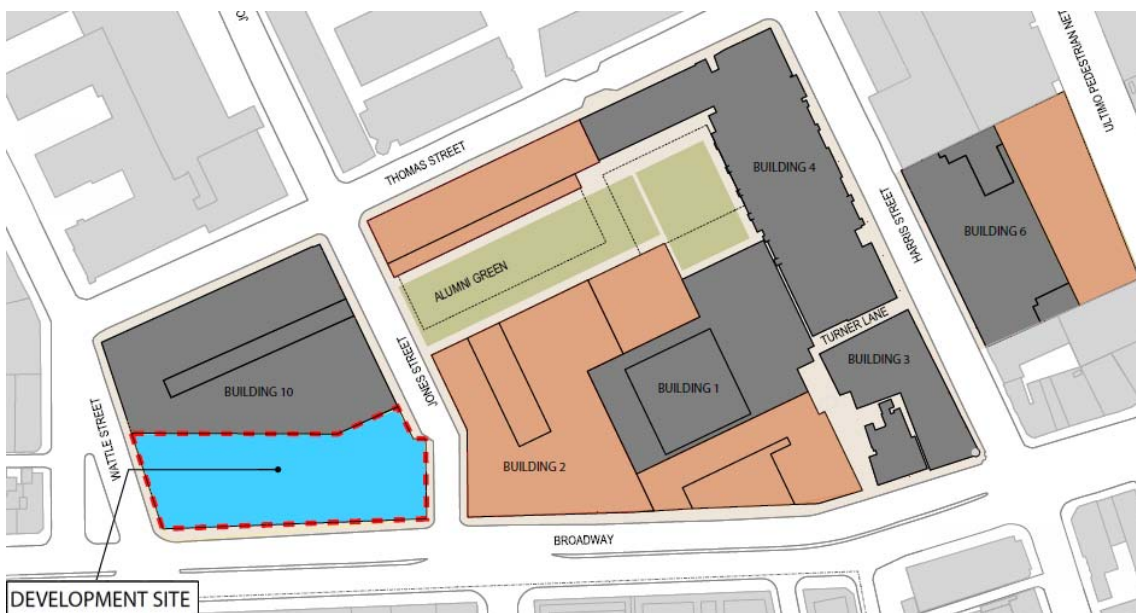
UTS Broadway Precinct and the Broadway Building site
